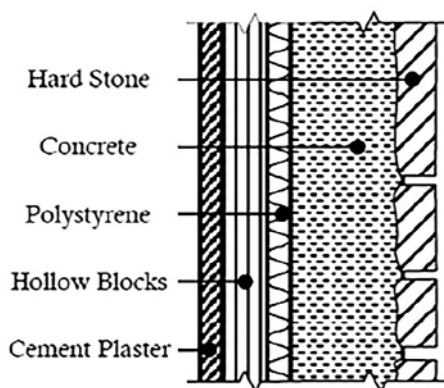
Typical insulated external wall envelope of a Jordanian building, source: Alsaad & Hammad, 2016, as cited in: Abdel-Fattah et al., 2022.
